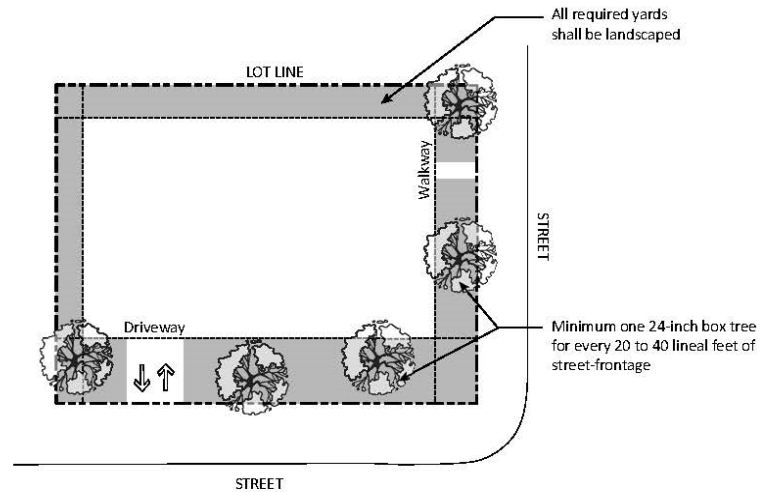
N.1.B: STREET FRONTAGE AND REQUIRED YARD LANDSCAPING
